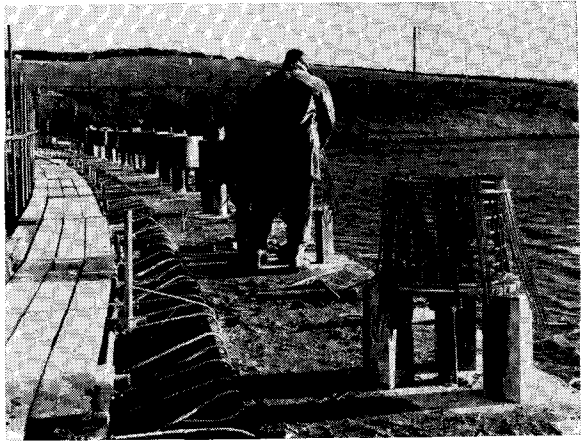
Argal Dam—Cables Bent Over Steel Cages
